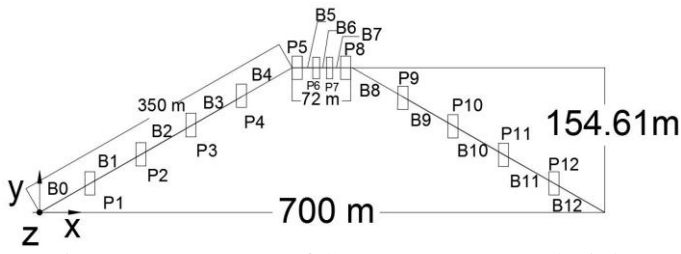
Arrangement of the Pontoon Supported Girder Concept
